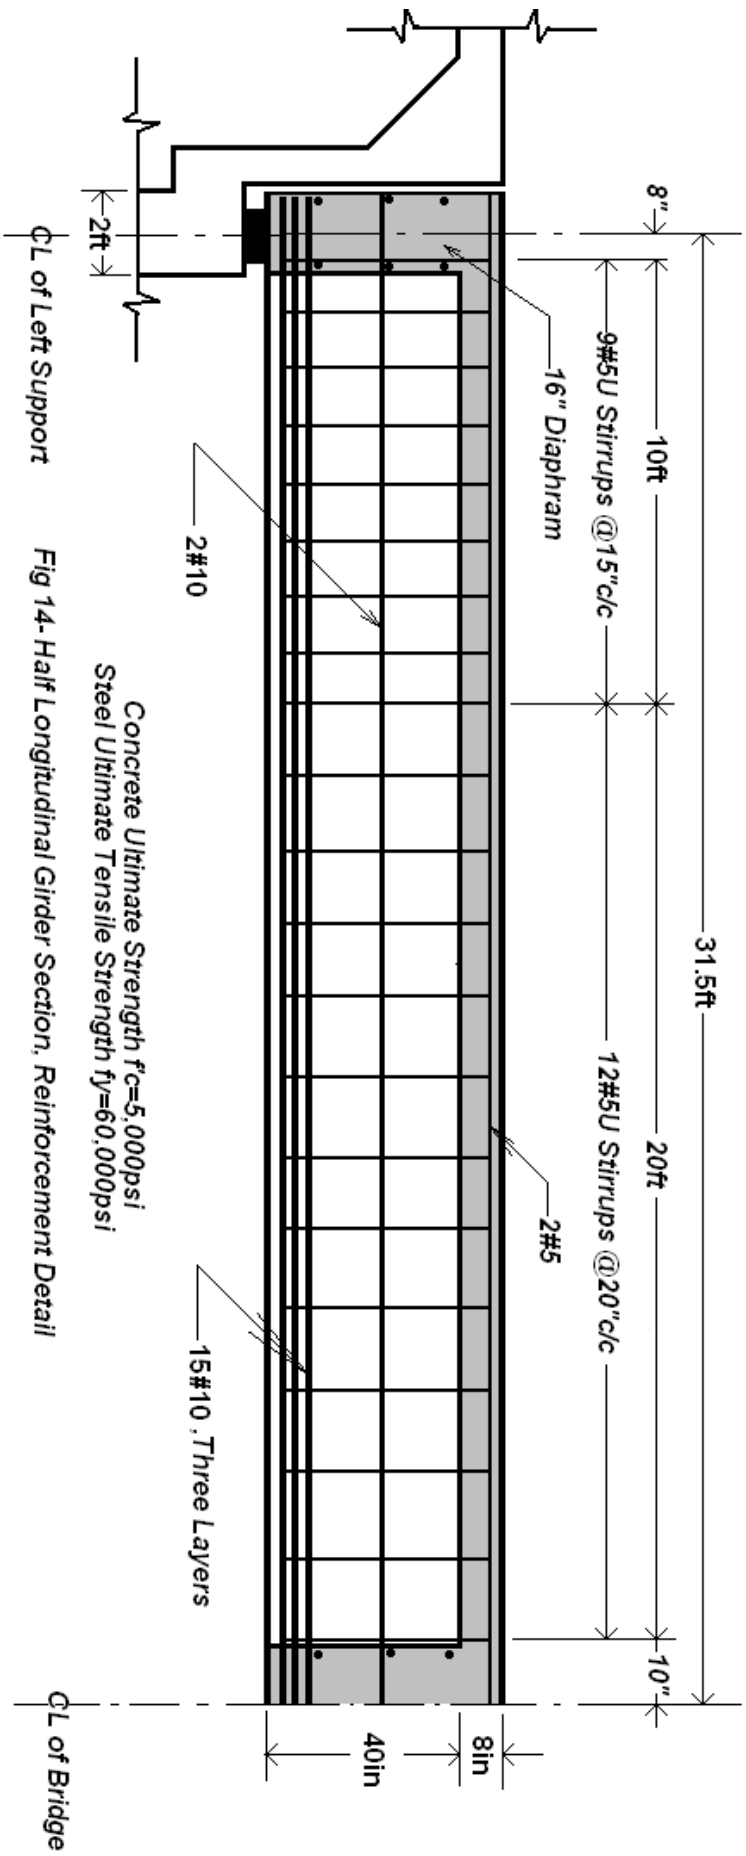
Half Longitudinal Girder Section, Reinforcement Detail
